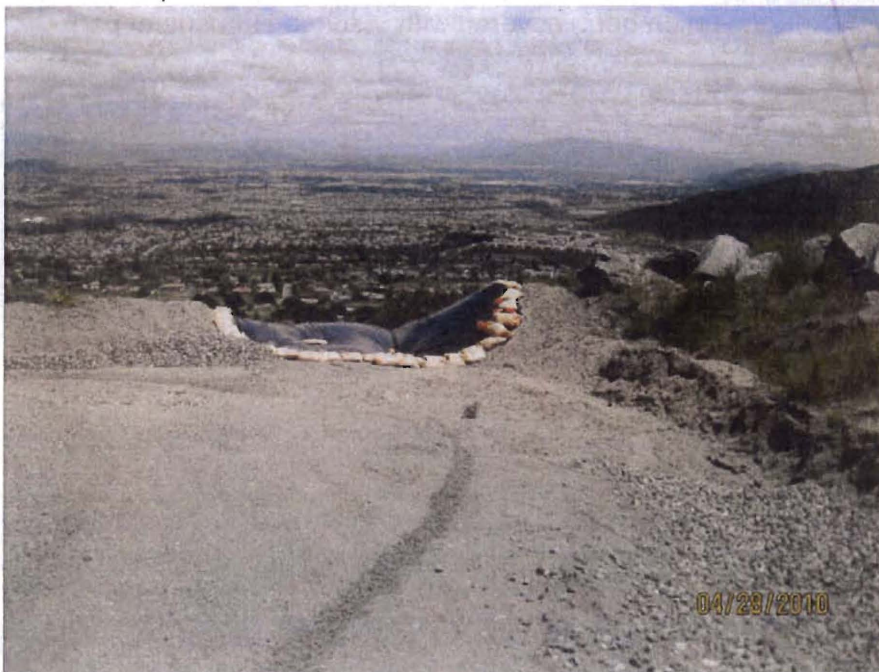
Nunez pad drainage toward temporary Visqueen-lined outlet.
